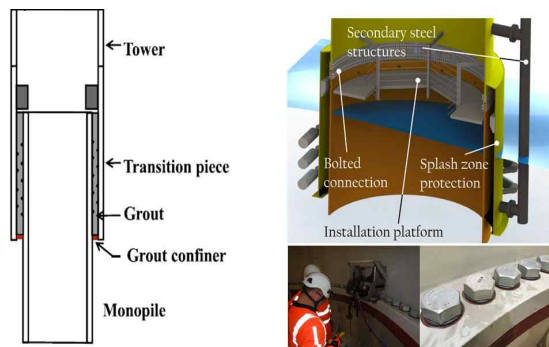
Grouting connection (left) and flange connection (right) between monopile and transition piece
